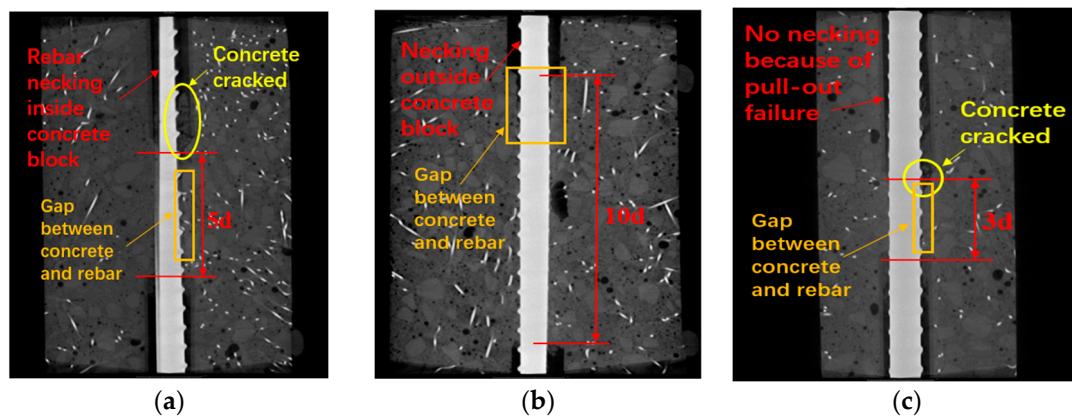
CT scan work of rebar necking, concrete cracking and slip between concrete and rebar. (a) Specimen: SFRC-5d. (b) Specimen: SFRC-10d. (c) Specimen: SFRC-3d.
